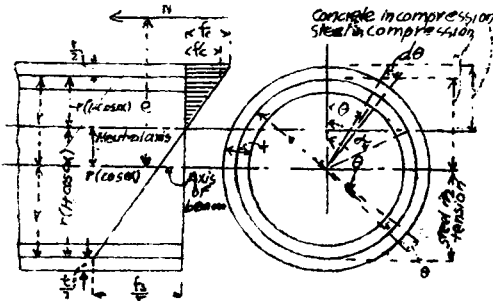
DIAGRAM SHOWING REINFORCED CONCRETE CHIMNEY
